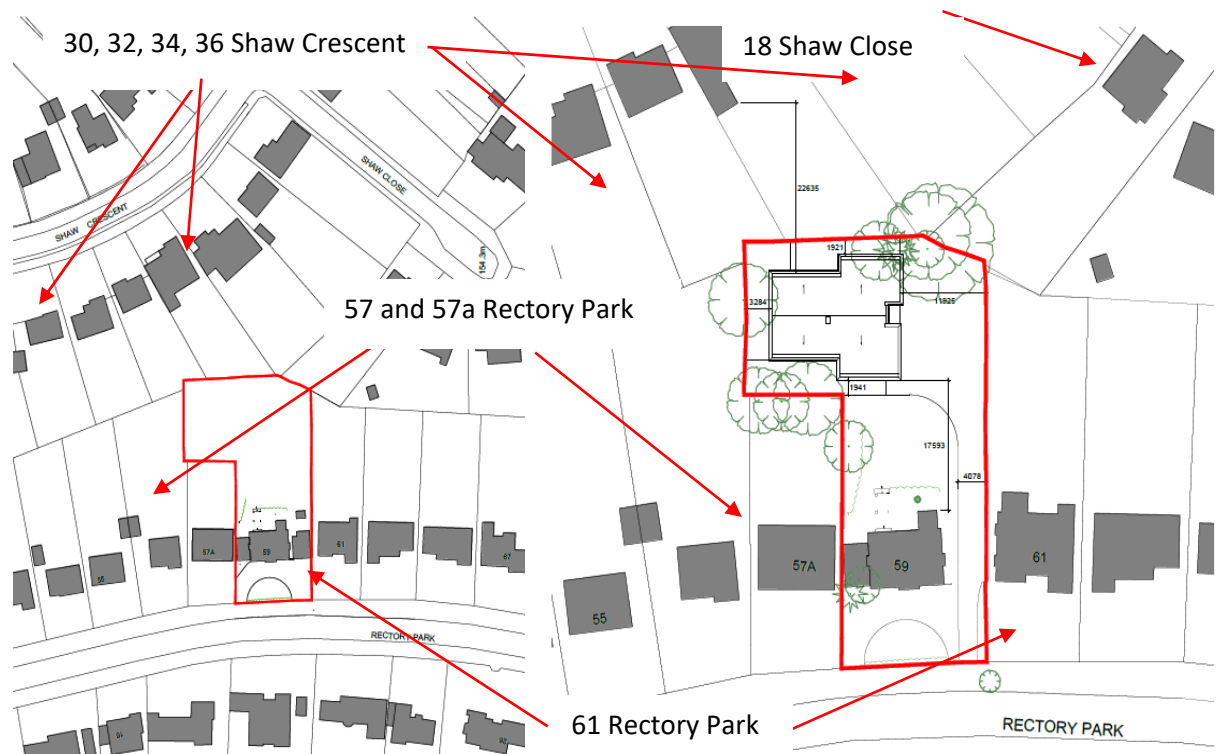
Existing Site Plan (left) and Proposed Block Plan (right)
